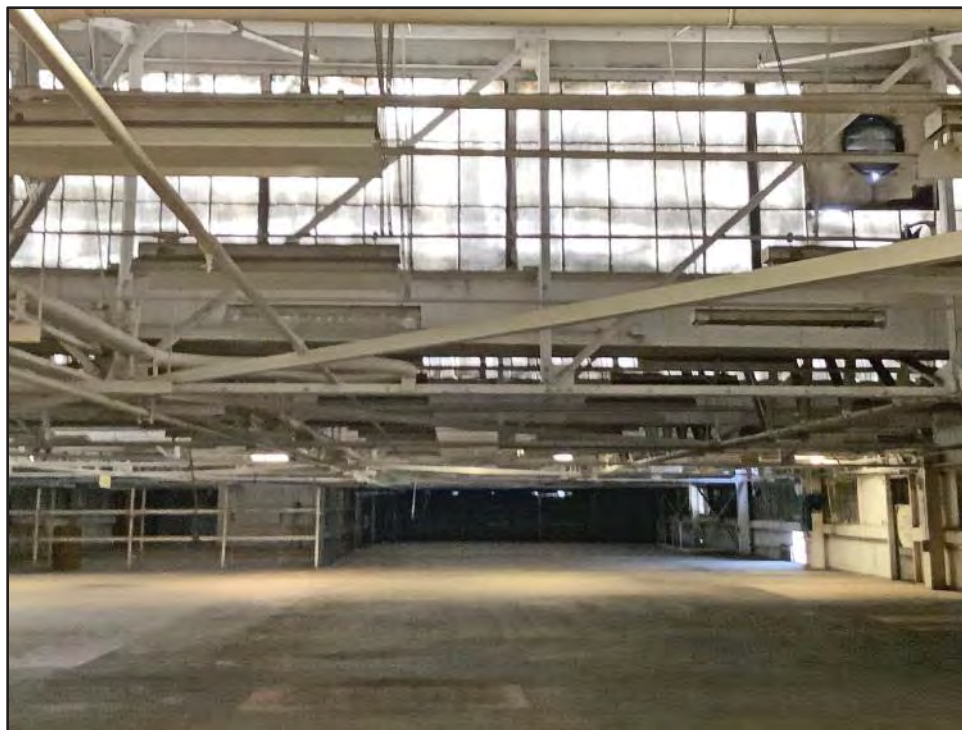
Building 8 Interior, Third Floor. View toward the northwest.
